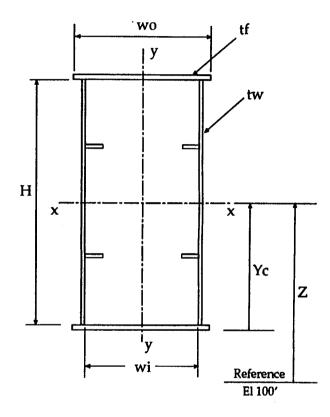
Initial Section Sizing for Gantry Leg at Top
